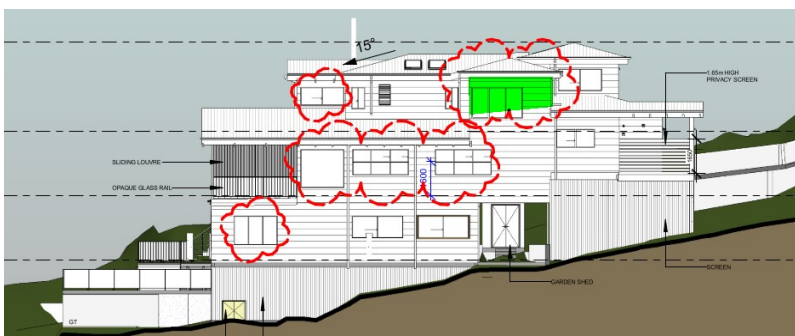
Extent of additional building envelope non-compliance on the western elevation shown in green.
